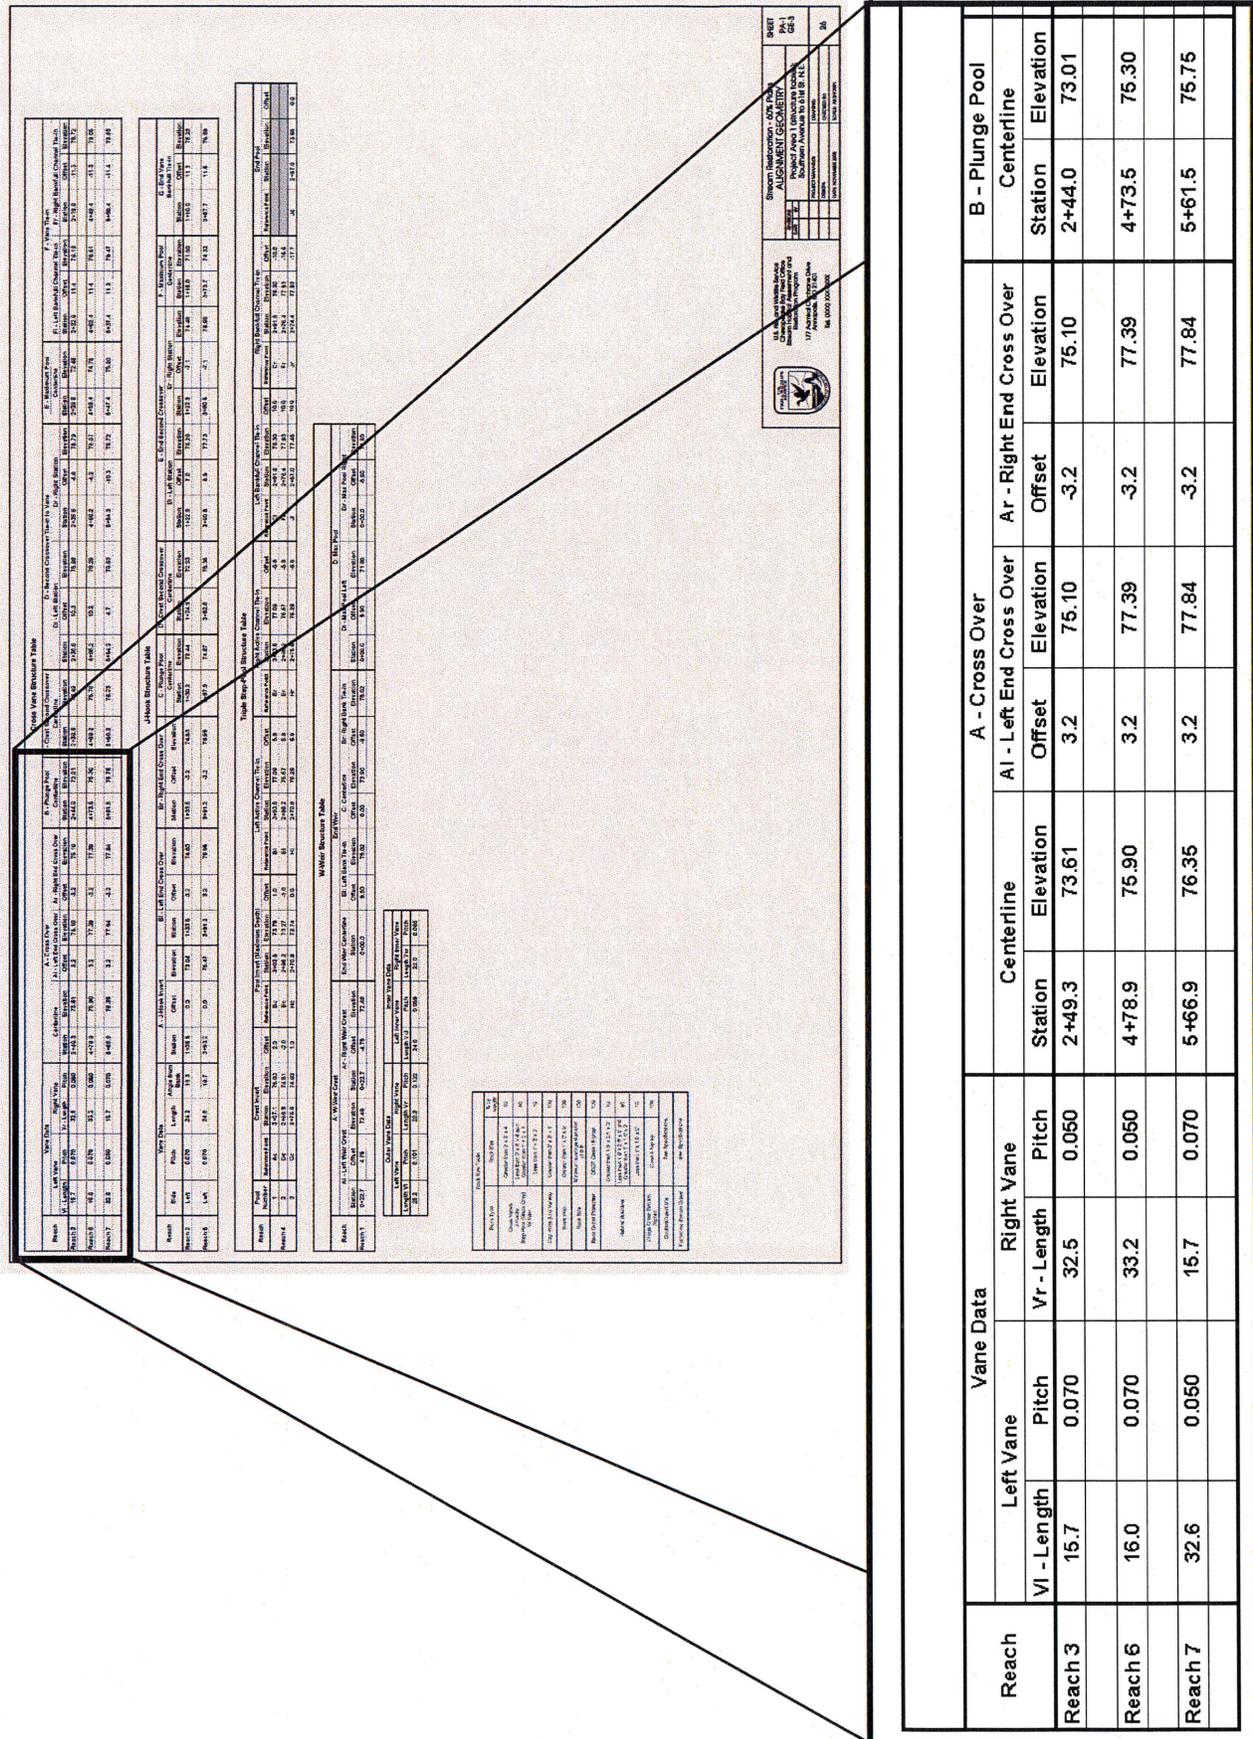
Example of structure (e.g. cross vane, step-pools, etc.) tables with relevant structure elevations
